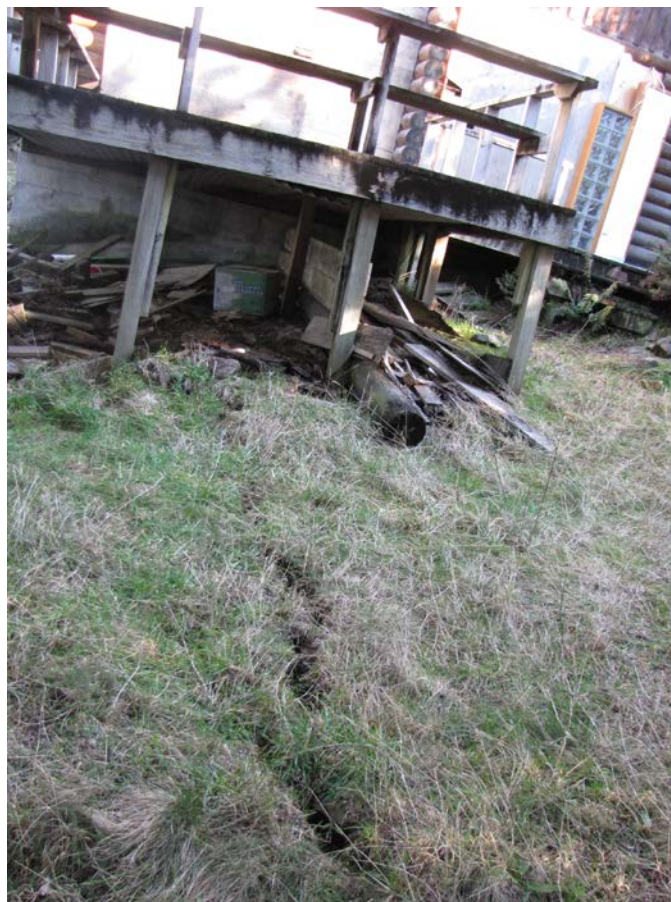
Typical foundation settling adjacent to a split-level log house at Mt Lyford Village. Note the subsidence of the ground and ground cracking extending away from the house (concrete pad).
